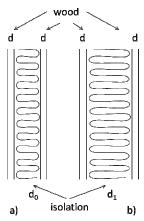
Model wall construction, a) original isolation, b) improved isolation. d_0 = original thickness, d_1 = thickness of wider insulation, d = thickness of the inner and outer wood wall
